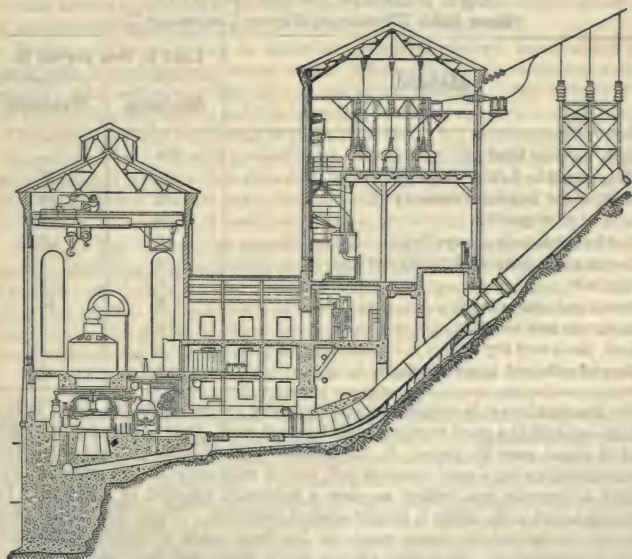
Cross Section of Power House; Roof Trusses with Raised Chord
